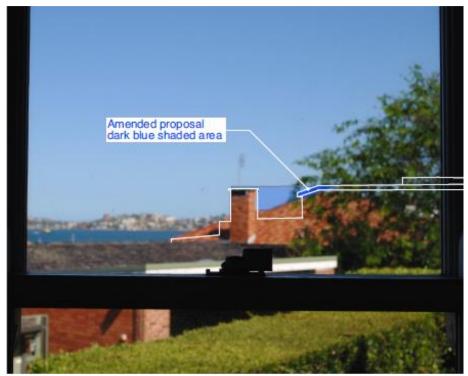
Montage of proposal at 35mm focal length 176 Kurraba Road – Location 1
